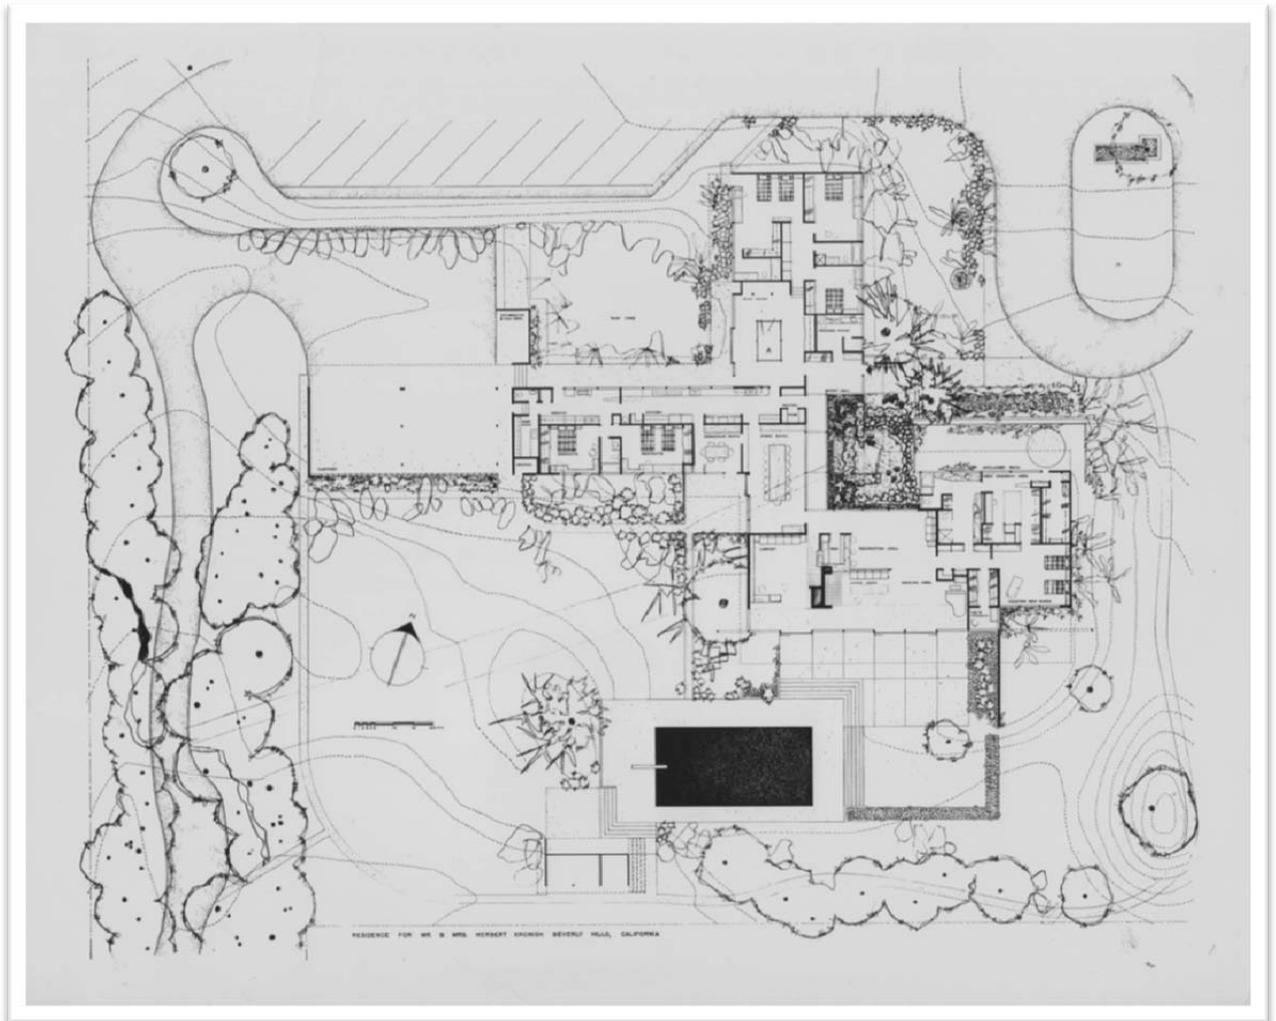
Initial floor plan, Kronish Residence (nd)
